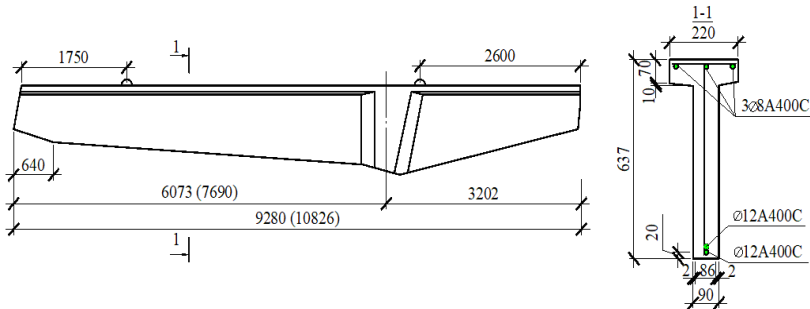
Construction and reinforcement experiment “natural” construction ЗБК – 18–18 (geometric parameters of the structure, transverse and longitudinal reinforcement, detailed calculation of formation, width of crack opening and distances between cracks with a multi-level scheme of their formation as proposed by I.A. Yakovenko models of deformation of reinforced concrete taking into account the effect of breaking the integrity of concrete are given in the work⁵⁷, example No. 40)
